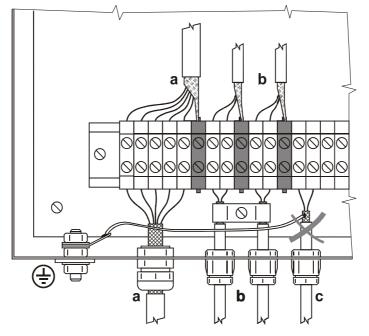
An example of connecting cable shielding in the control panel
